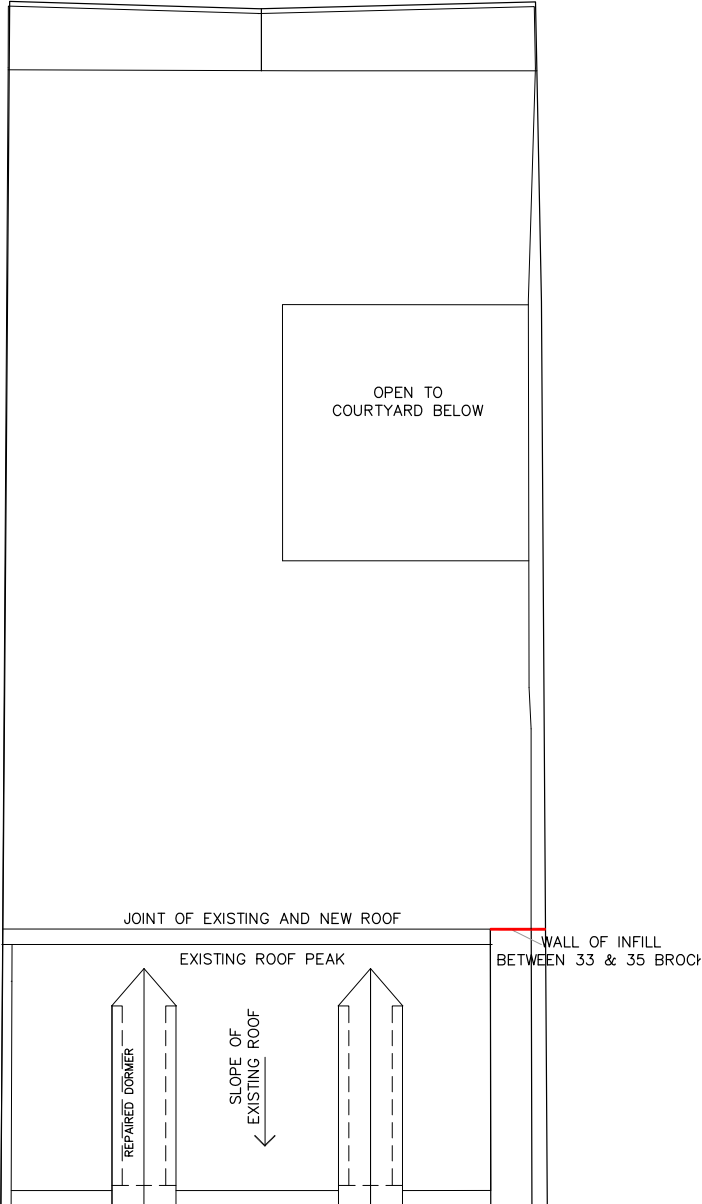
Drawing showing new roof plan with location of infill wall highlighted.
